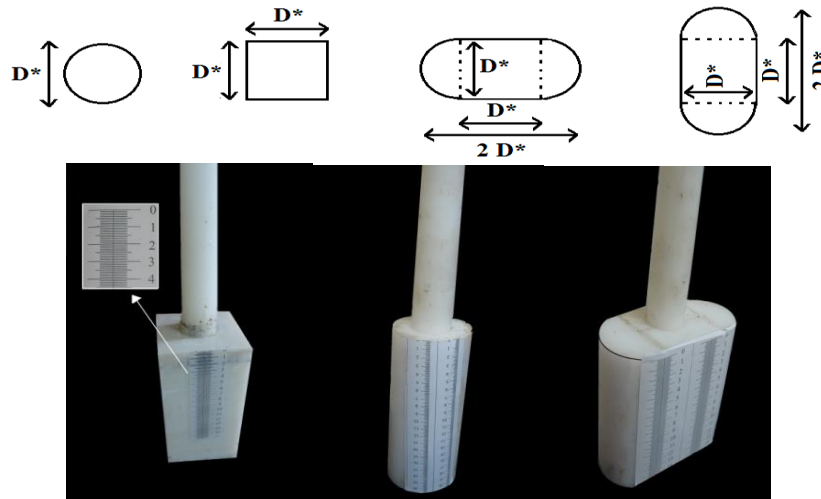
Foundation shapes used along the flow (non-uniform piers).
